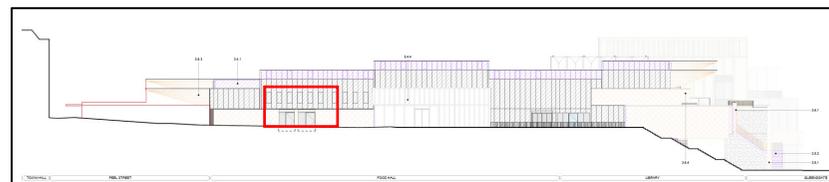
The Princess Street elevation as consented, with part of the elevation removed and the consented new doorway highlighted.
